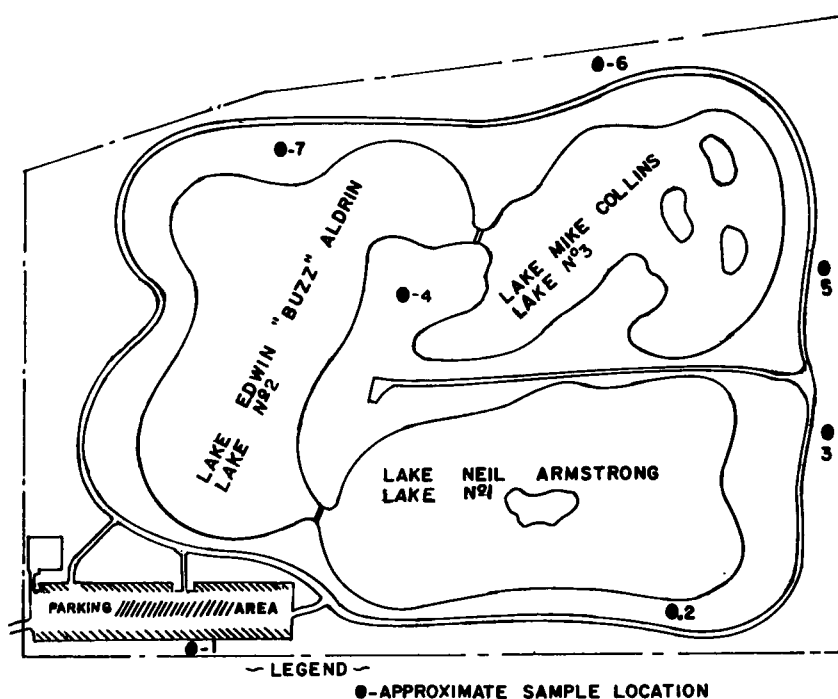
SOIL TEST LOCATIONS AT PARKSITE
